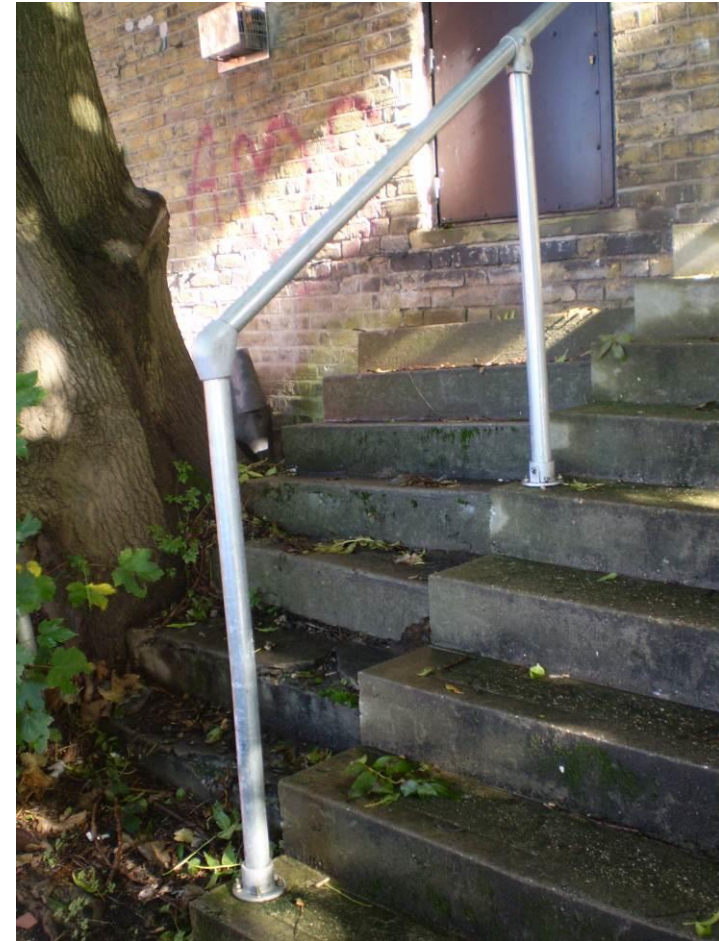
View of steps to rear adjoining property with steps to N° 171A beyond
